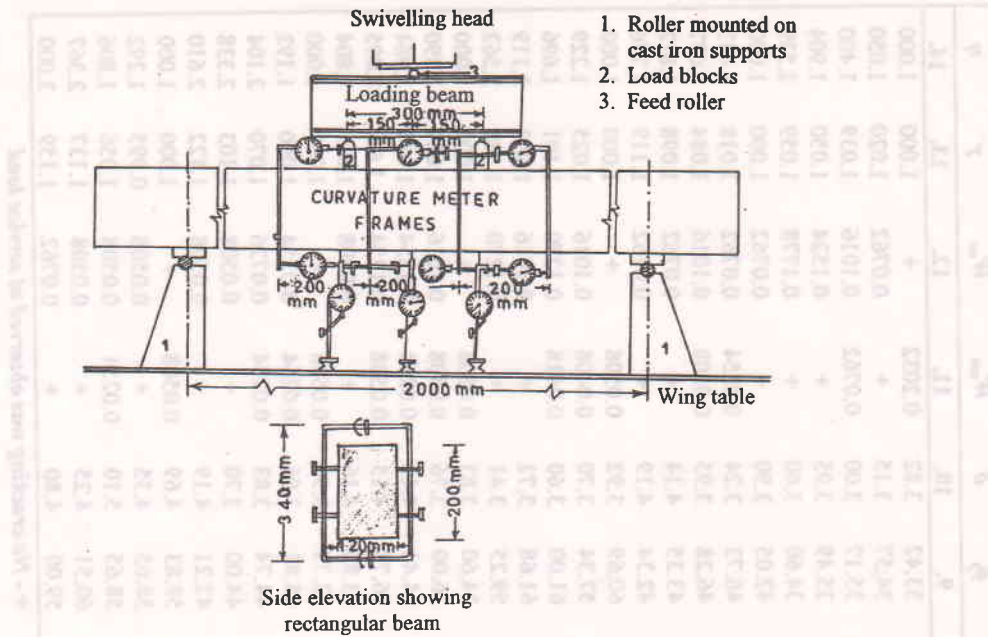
Test set-up of curvature meters and deflectometers and cross-section of beam.
